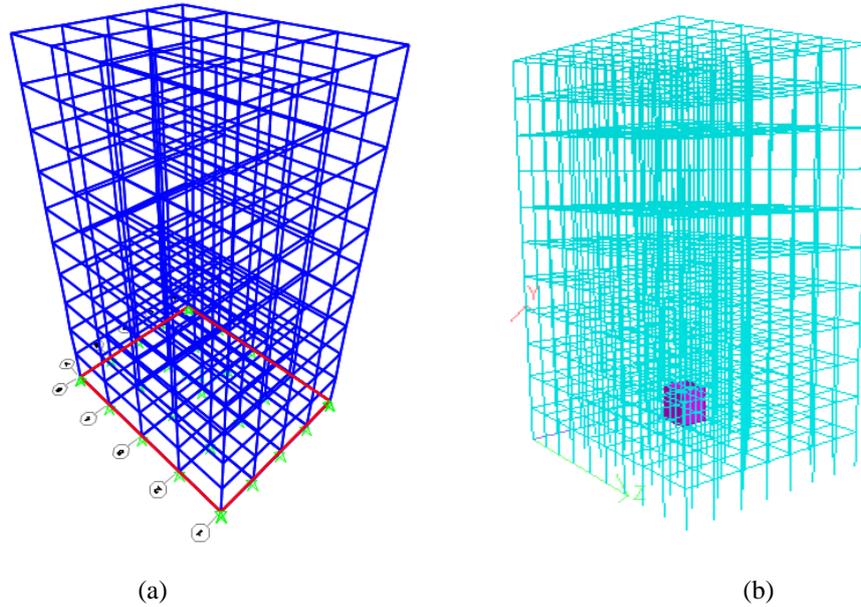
(a) Model of the Building (b) Building with Tuned Damper
